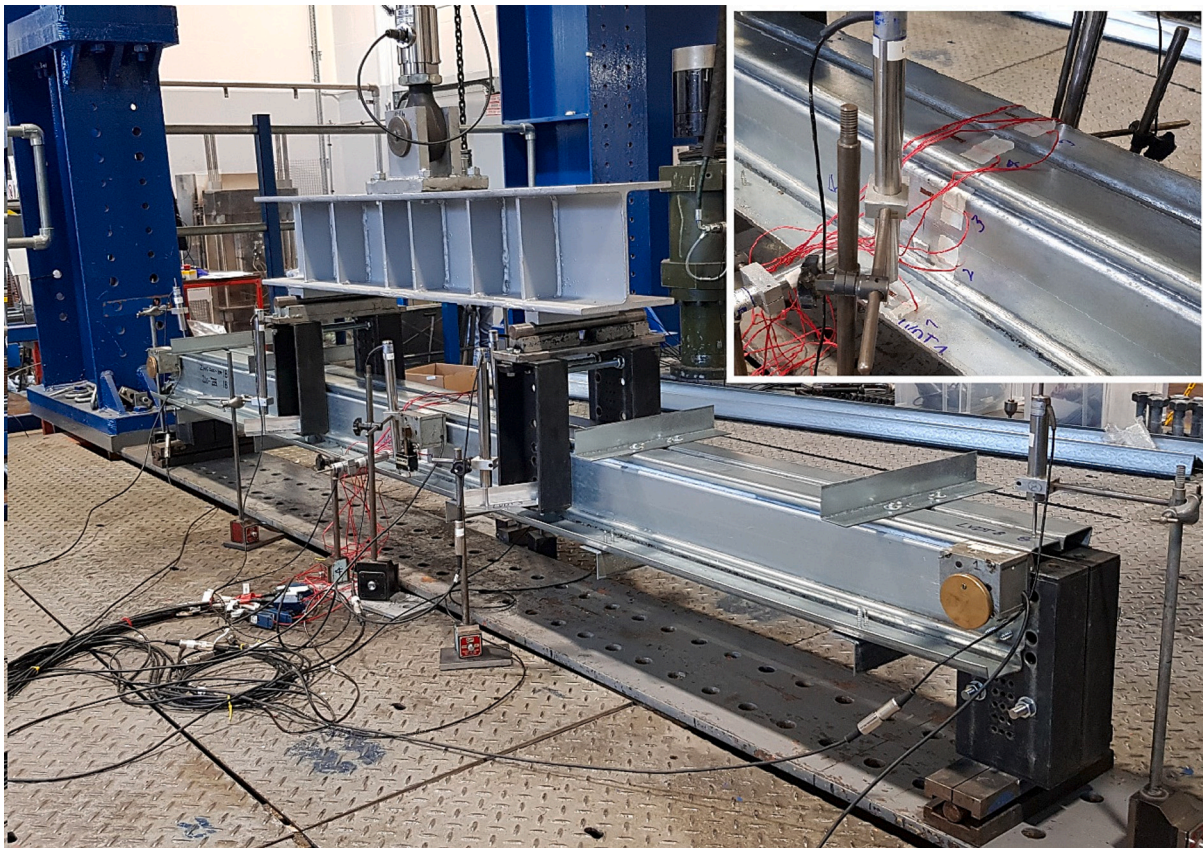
Four-point bending test setup, showing zed sections and strain gauge and LVDTs arrangement at mid-span of the sections (in the small box).
